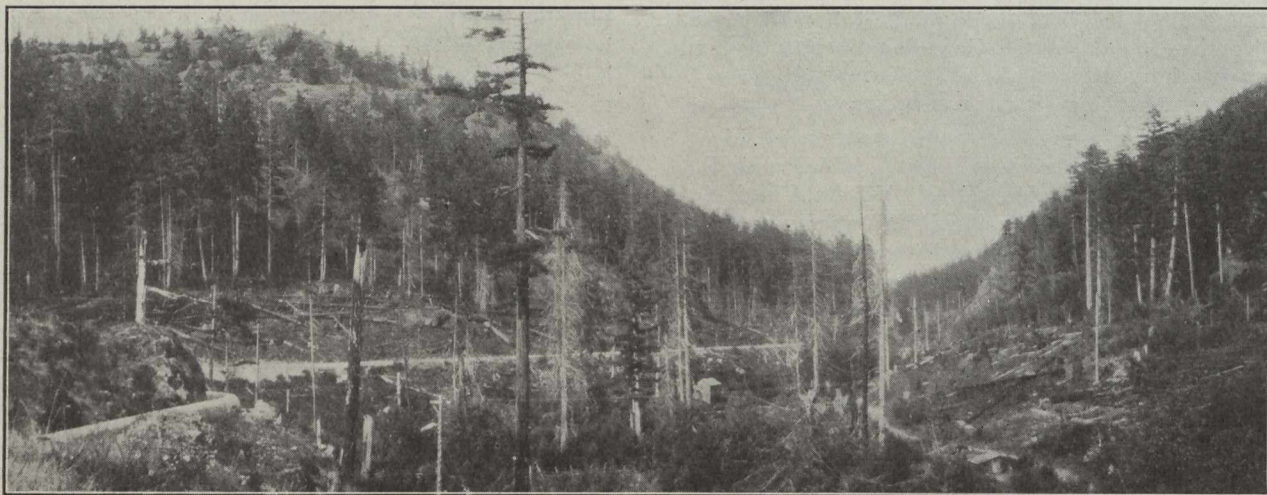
Concrete Pipe Along Humpback Road, Showing Nature of Country Which the Line Traverses.
